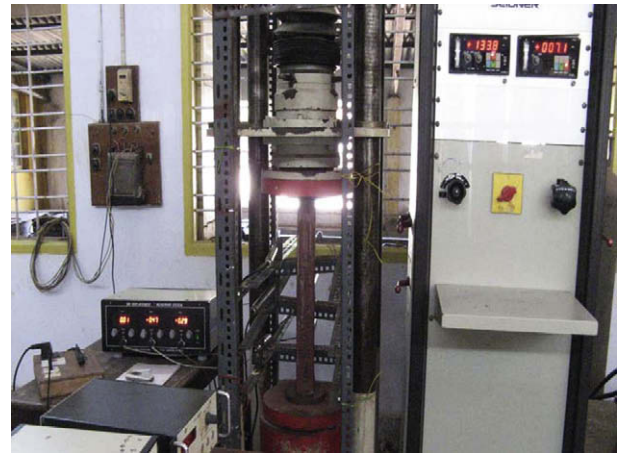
Compression test on CFT sample in the Column Testing Machine – an experimental setup.
